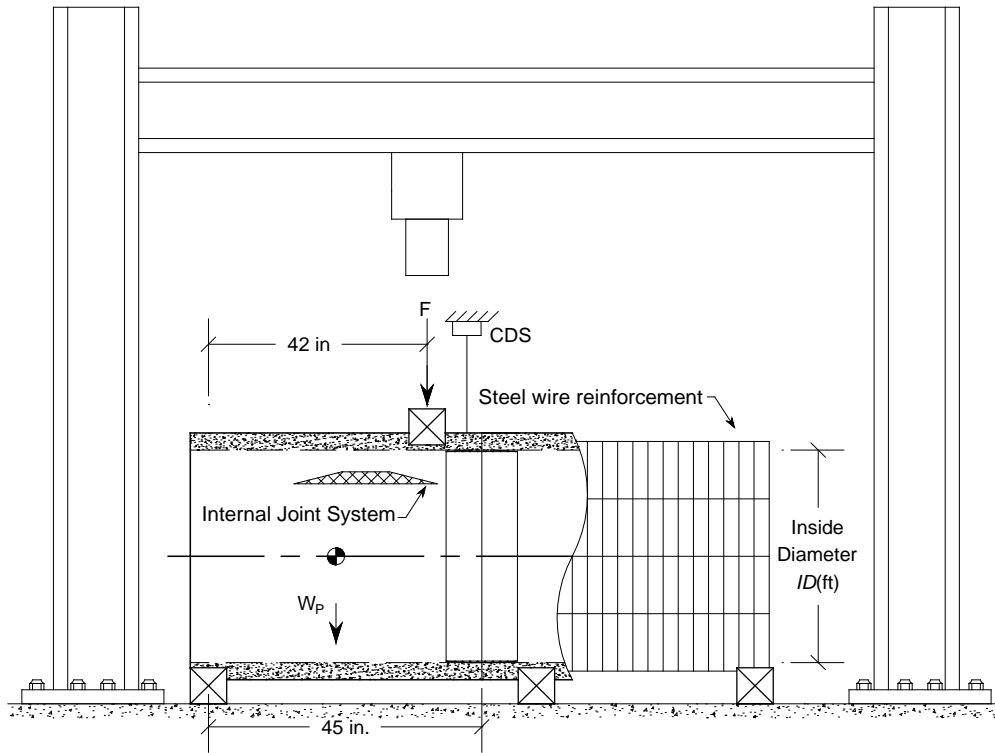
Configuration of joint shear test on TW concrete pipe with the CFRP coupler
